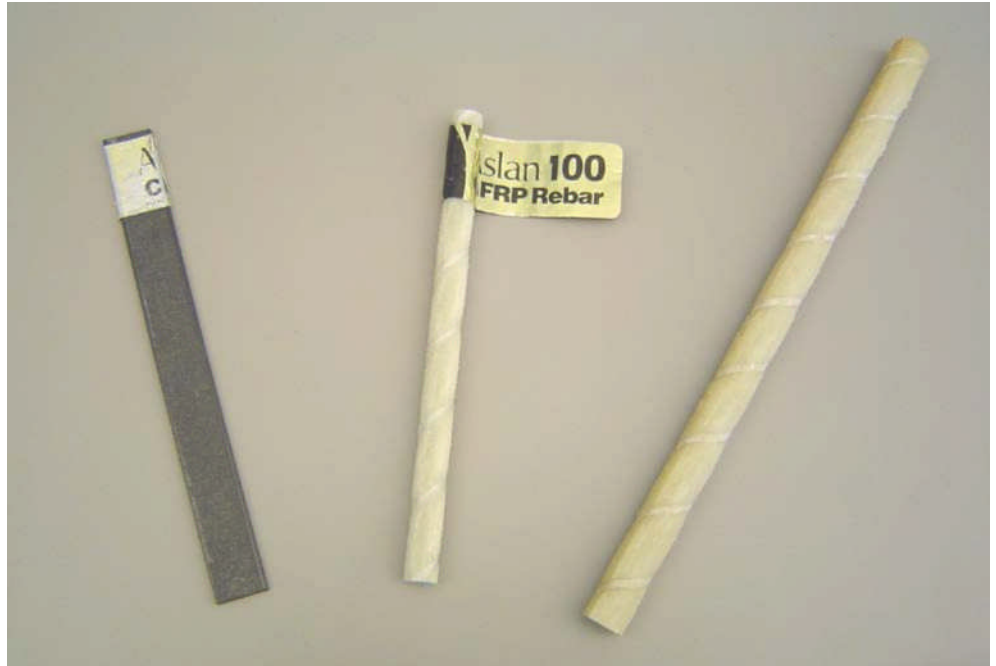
CFRP Plate and GFRP Reinforcing Bars
